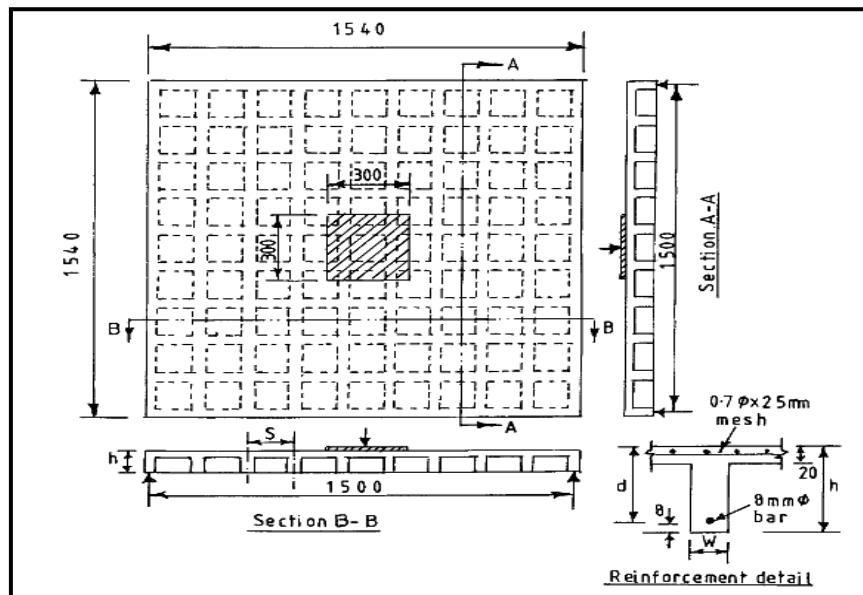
Geometry of Waffle Slabs, Loading Arrangement, and Reinforcement.^[2]
